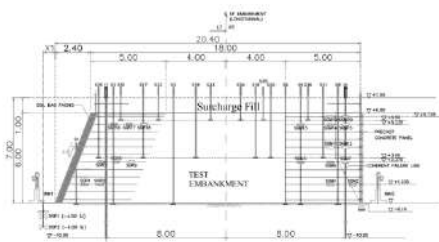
Cross section of MSE wall/embankment indicating the location of the monitoring instrument.
